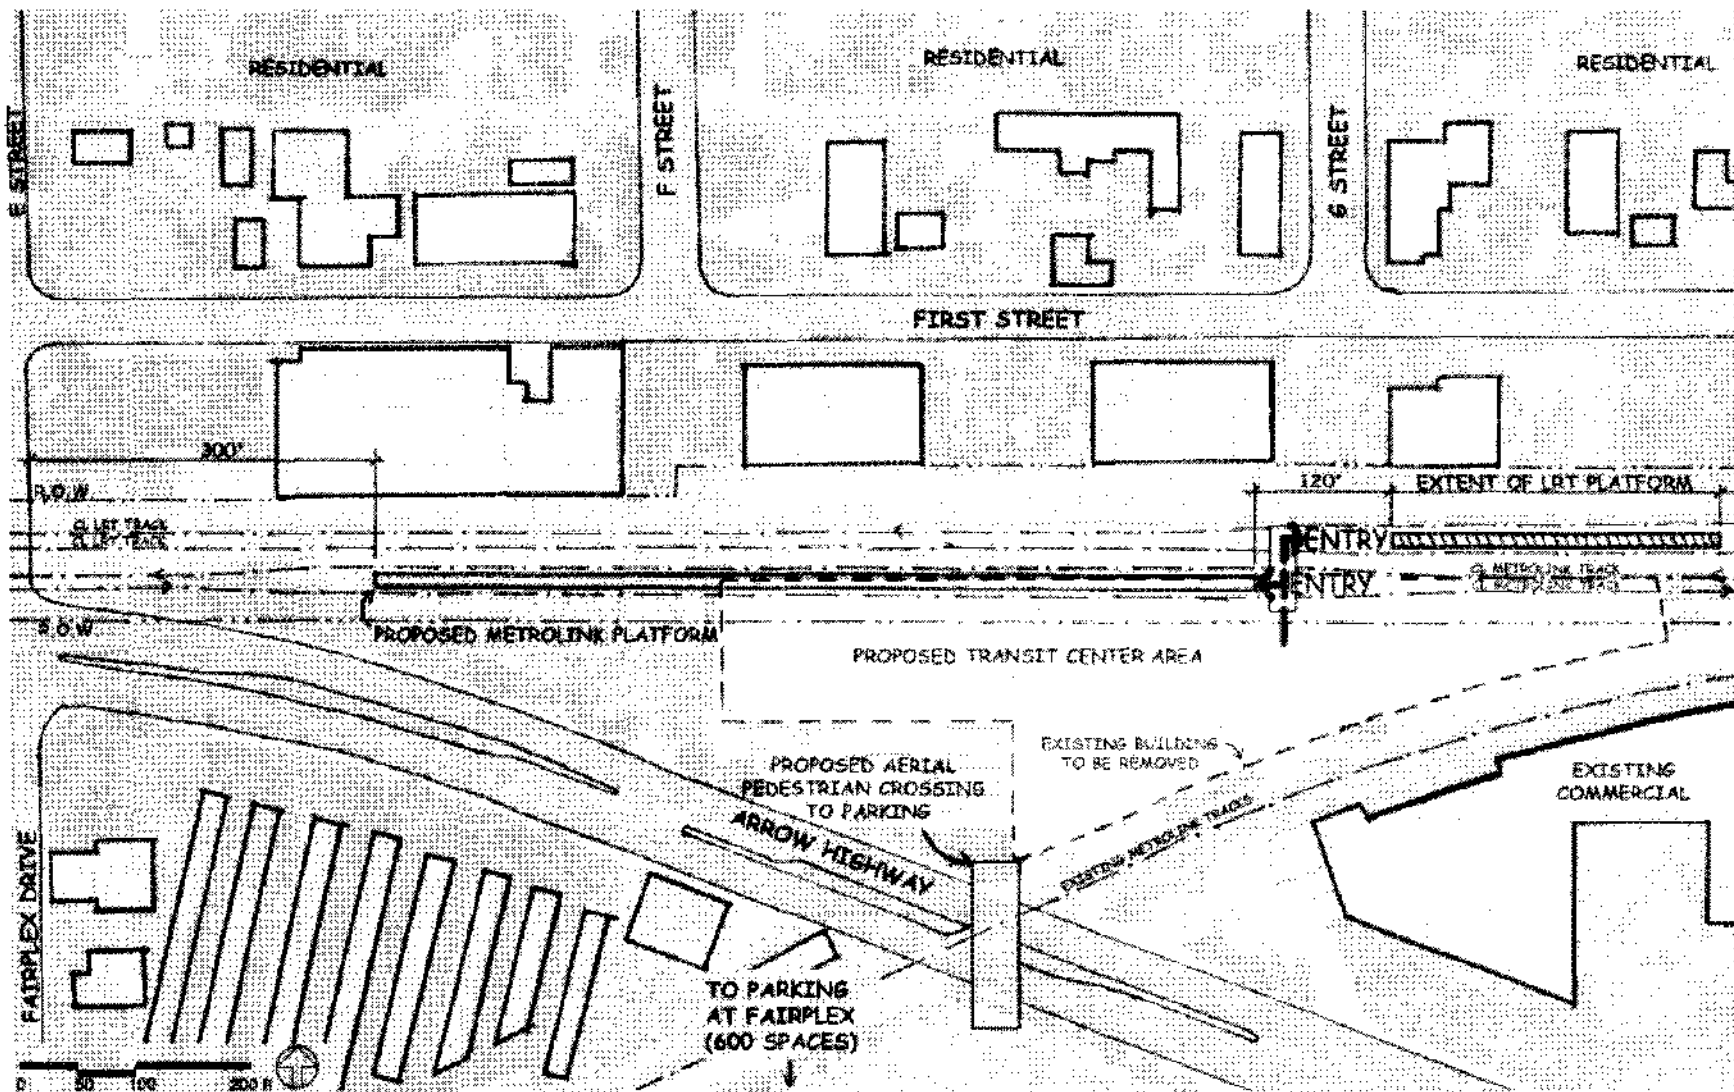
Site Plan: City of La Verne, Fairplex Station Option D
